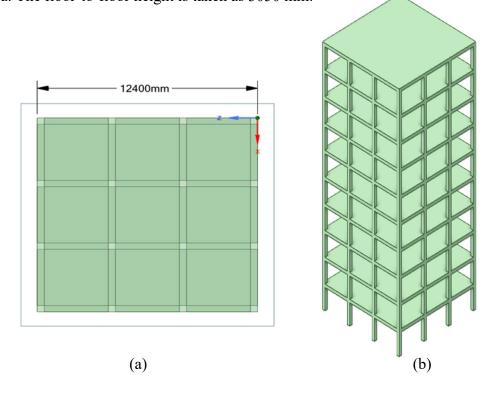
(a) Structure plan, (b) 3d Ansys model of the building
